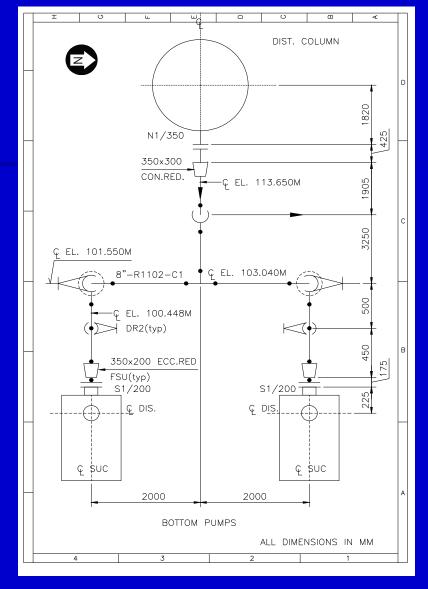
TYPICAL GENERAL ARRANGEMENT OF PIPING
